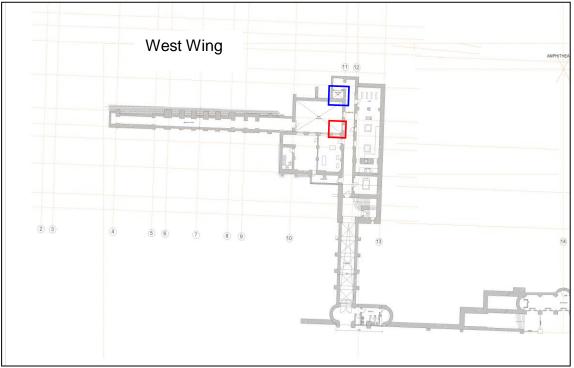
\_Overall Basement Floor Plan\_West Wing\_Location of existing Lifts (Source: Drawing Ikemeleng Architects, 2017)
